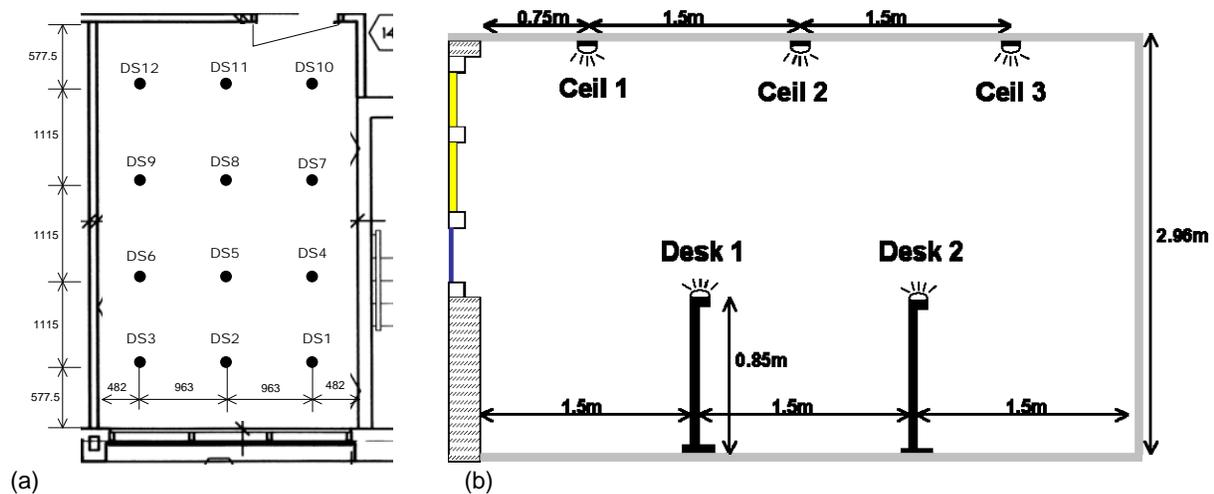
(a) Floor plan of the test space: For test cases TC1, TC2, TC4, and TC5 twelve work plane sensors were arranged in a three by four sensor grid, dimensions are in mm; (b) Section of the test space: For test case TC3 only two work plane sensors were collected.
